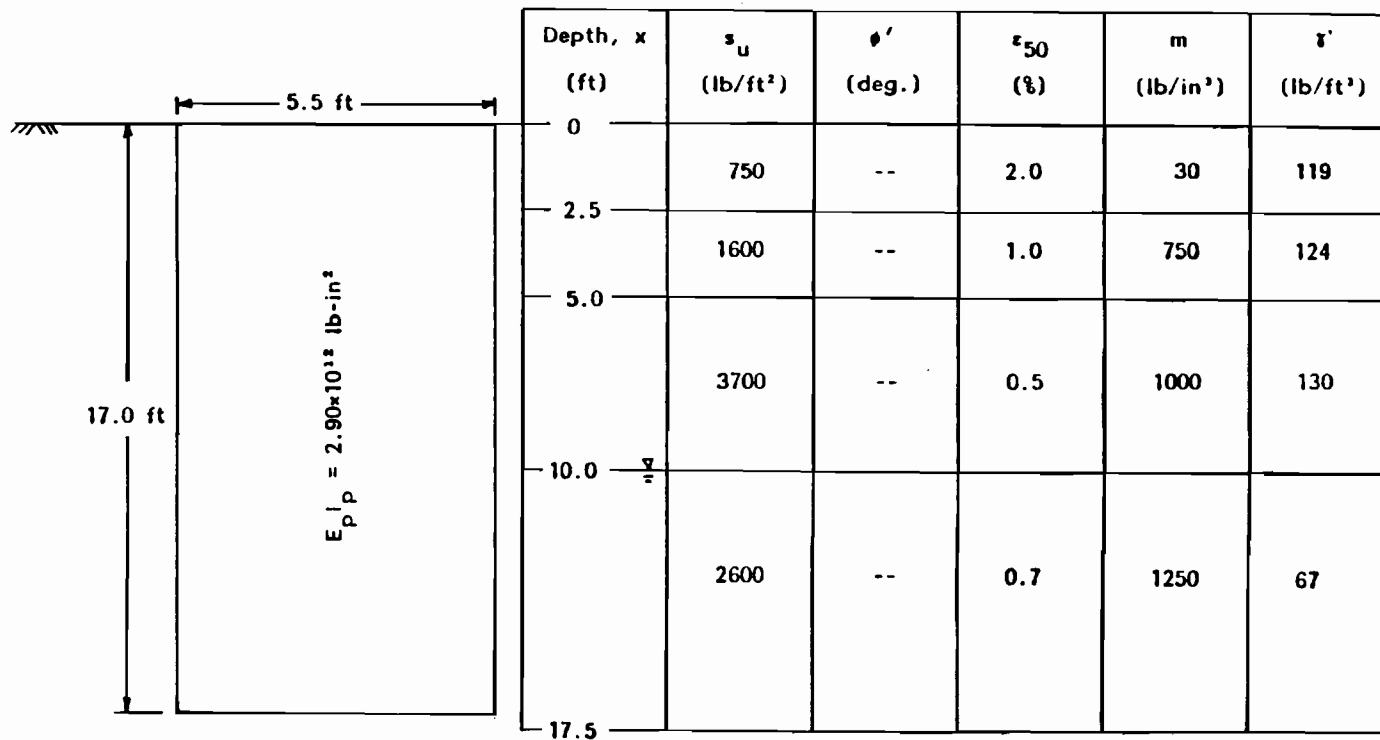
Soil and Drilled Shaft Data Used for COM624 Input, Shaft No. 16.
